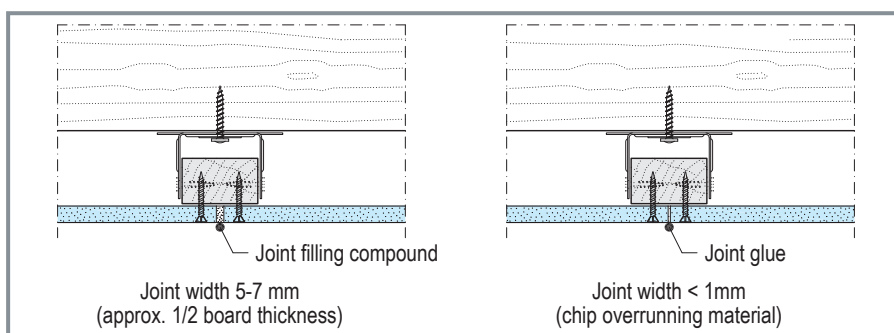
Filler joint and bond joint on gypsum fiber board joints
